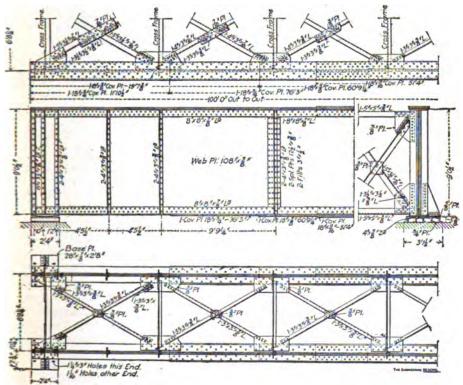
RAILWAY DECK PLATE GIRDER BRIDGE.
